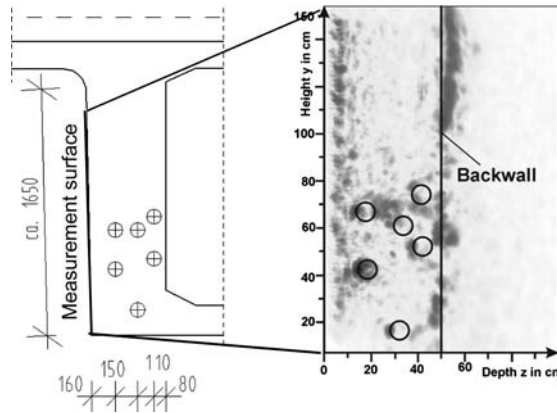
Arrangement of tendon ducts in the cross section (1/10-point 0.7) of a box girder web in Austria, left: according to construction plan, right: located at a SAFT-B-projection by ultrasonic echo.
